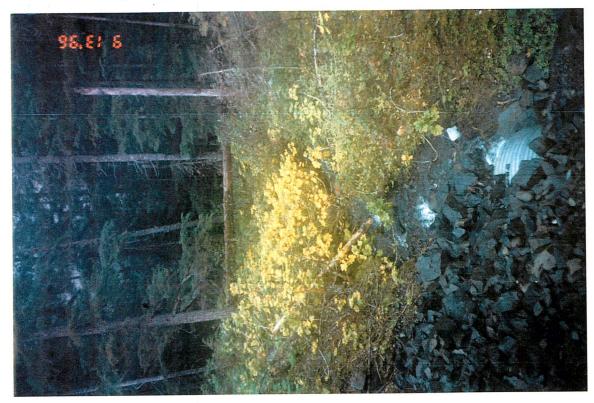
, 13-Sep-96 Site #: A15, Looking downstream from culvert.
